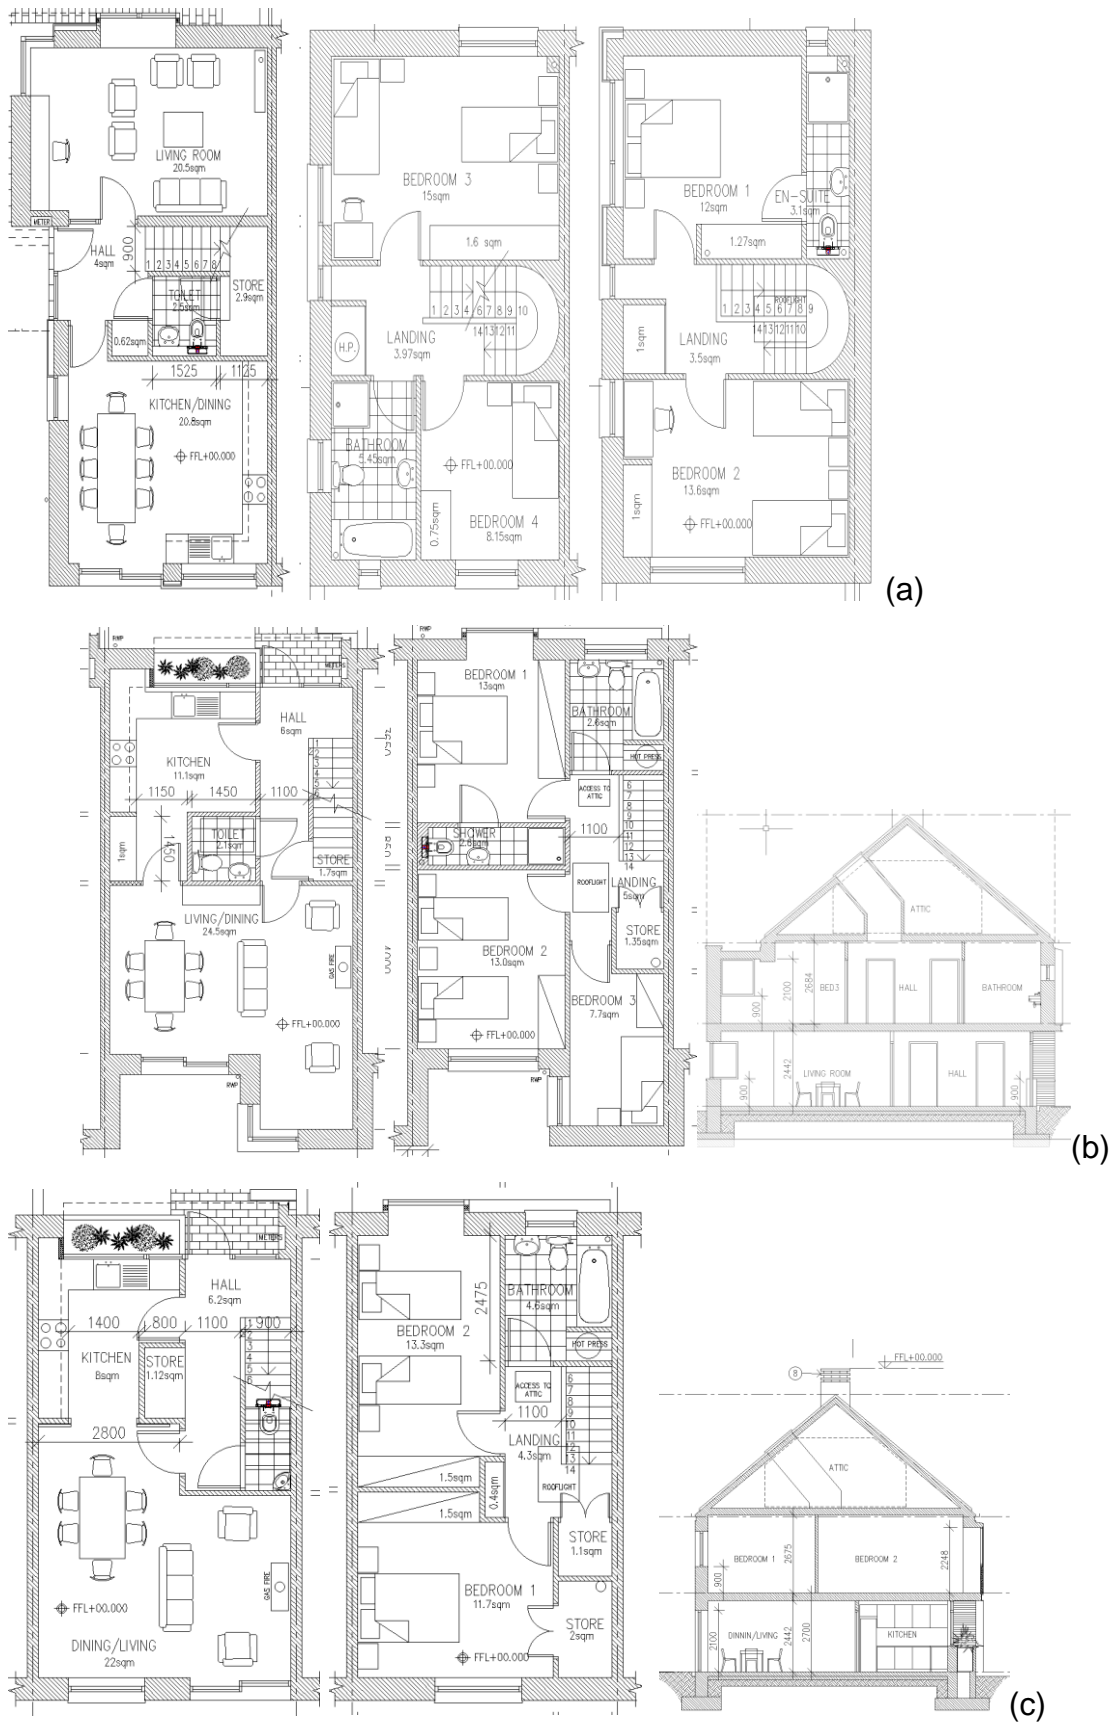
Typical plans for (a) four bedroom, (b) three bedroom and (c) two-bedroom houses in location 1
